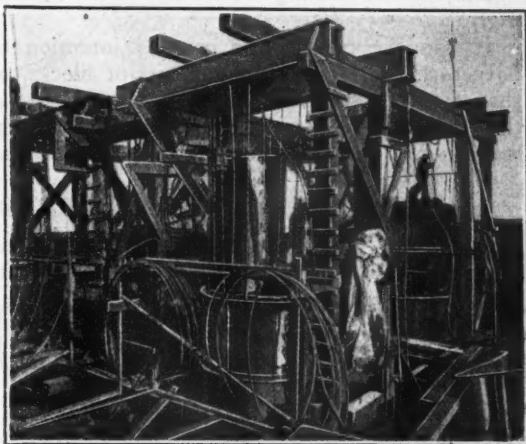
FOUR PAIRS OF WIRE CABLES SUPPORT EACH CAISSON.
